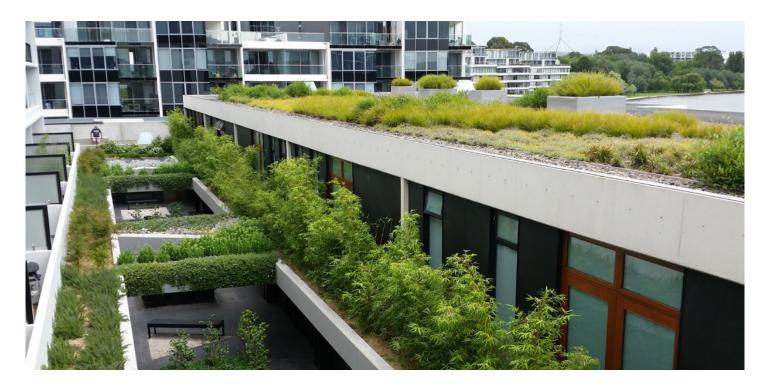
Green Roof at Bridgepoint, Canberra, ACT. Photo by Junglefy
